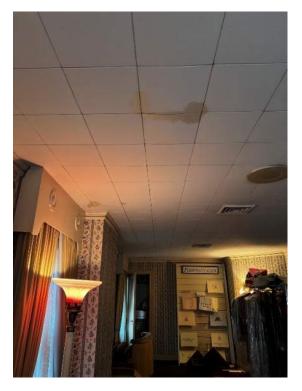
IMG_1466 – Second Floor East Chapel – Visible water damage and active leak at ceiling. Ceiling stain is wet to the touch.
